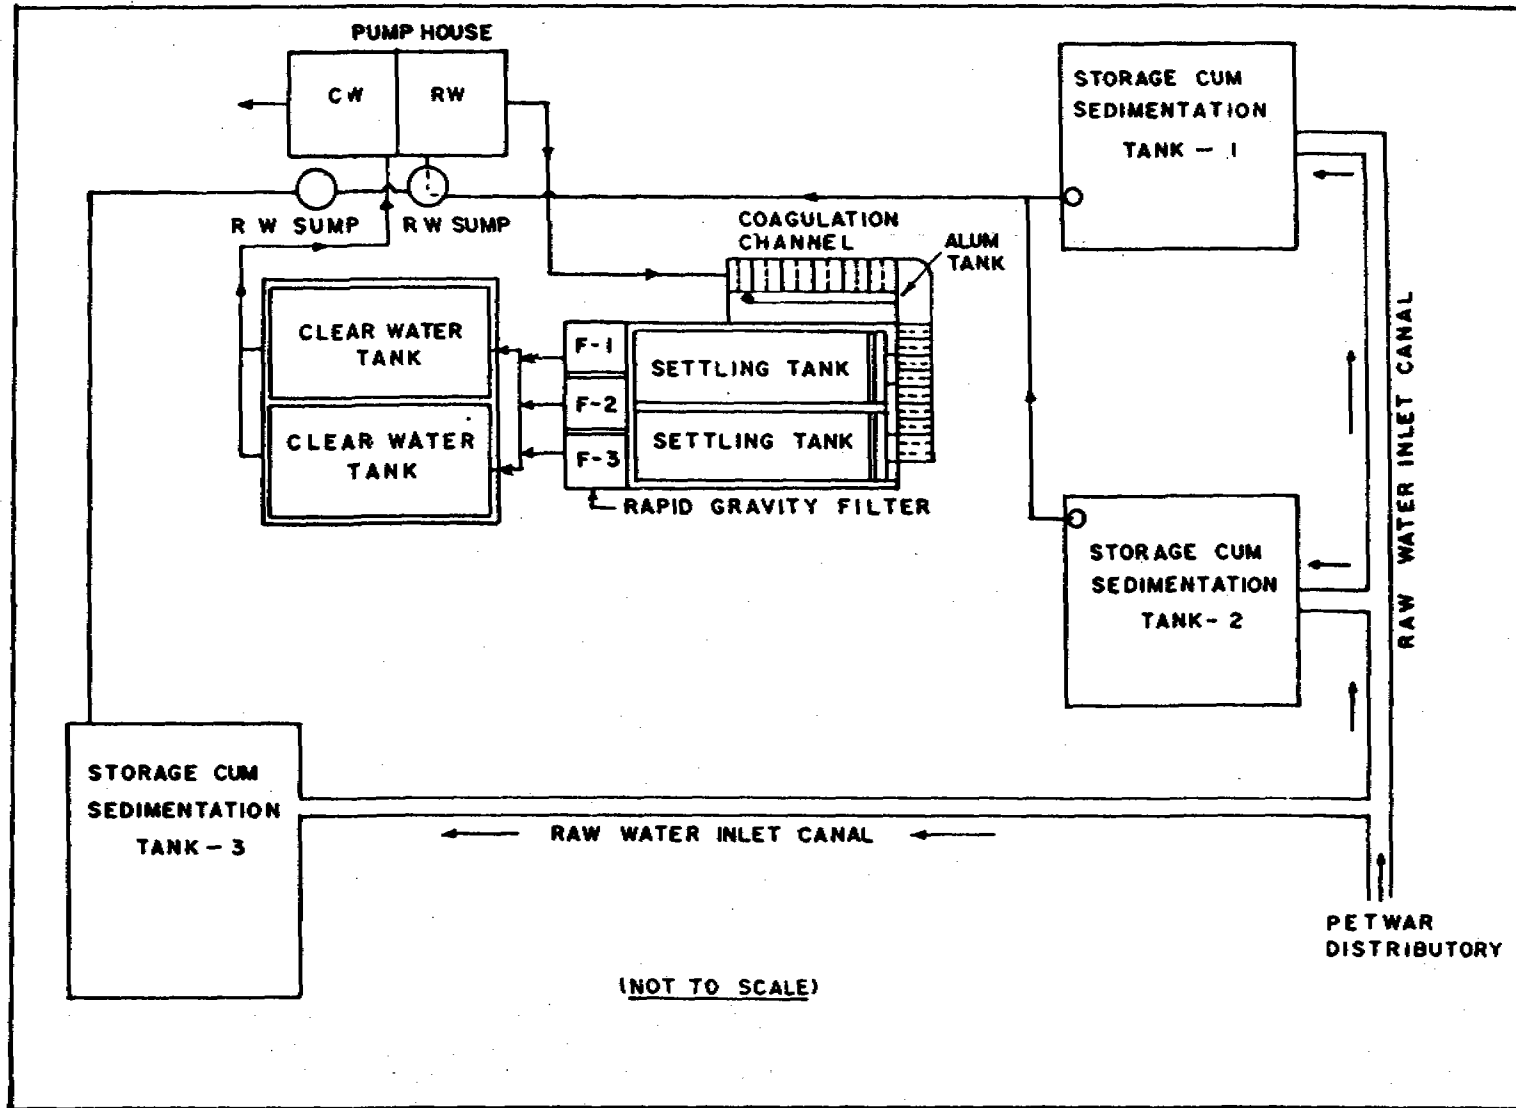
LAYOUT PLAN OF HANSI WATER TREATMENT PLANT
